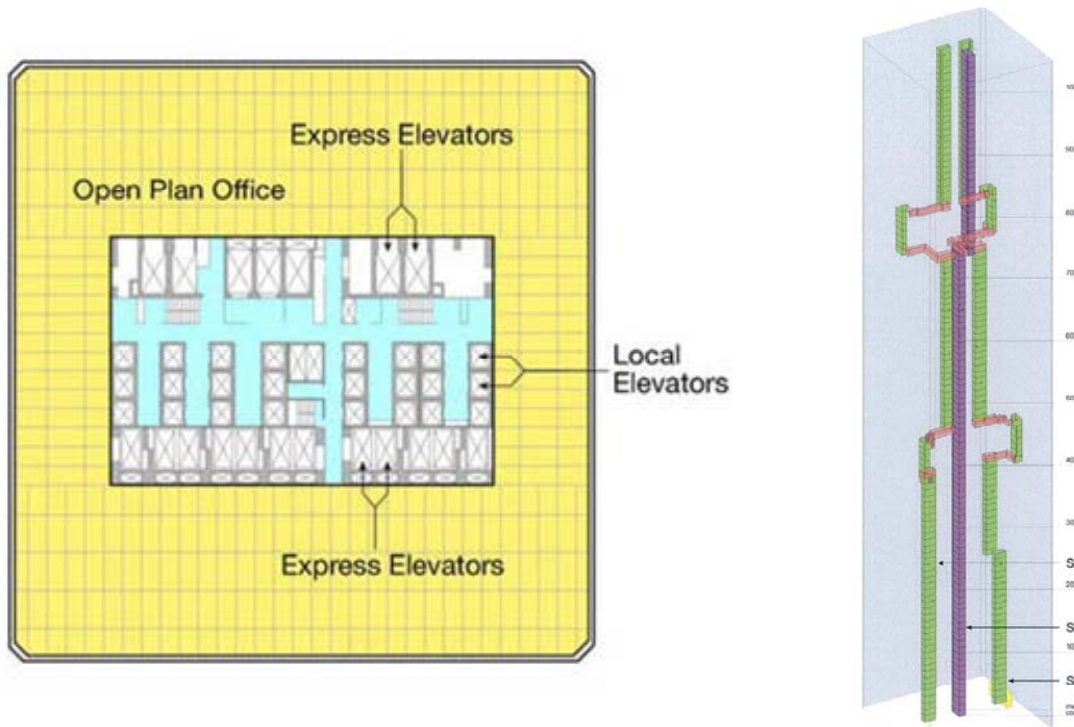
(a) The typical floor of the WTC (Source: Wikimedia.org); (b) The schematic diagram of the stairwells in the towers (NIST, 2005)
